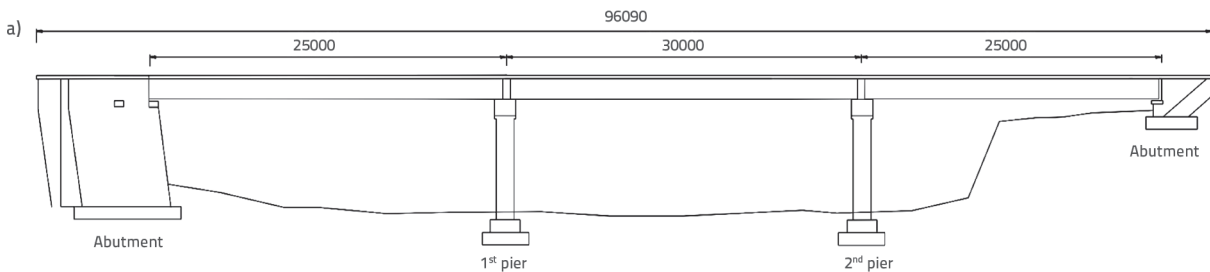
Bridge dimensions (mm): a) Longitudinal view of the bridge
